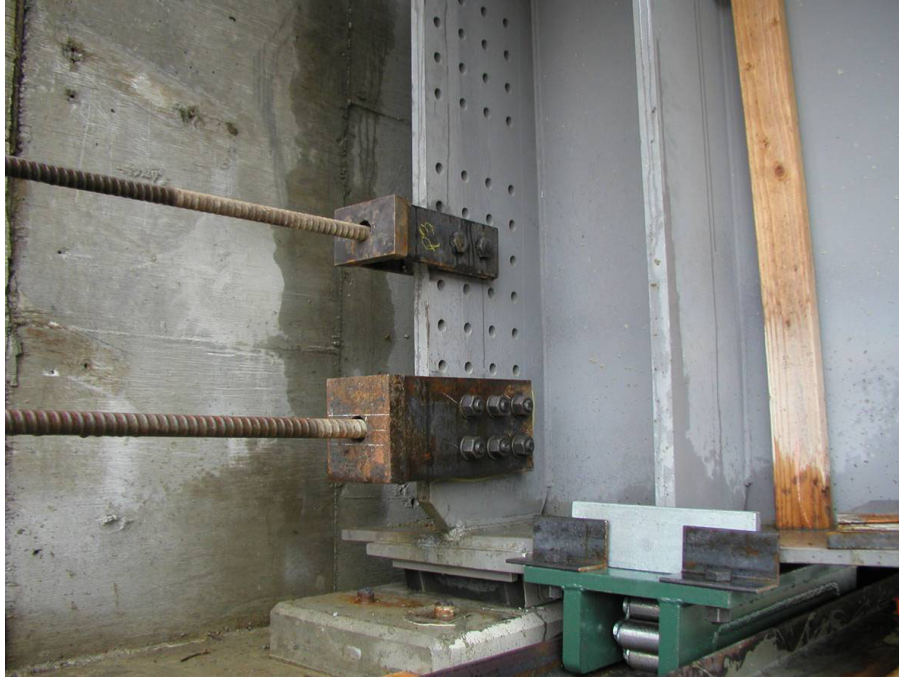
Connection of the high strength rods to the south half-bridge at a girder end. A Hilman Roller supports the girder at a jacking stiffener.
